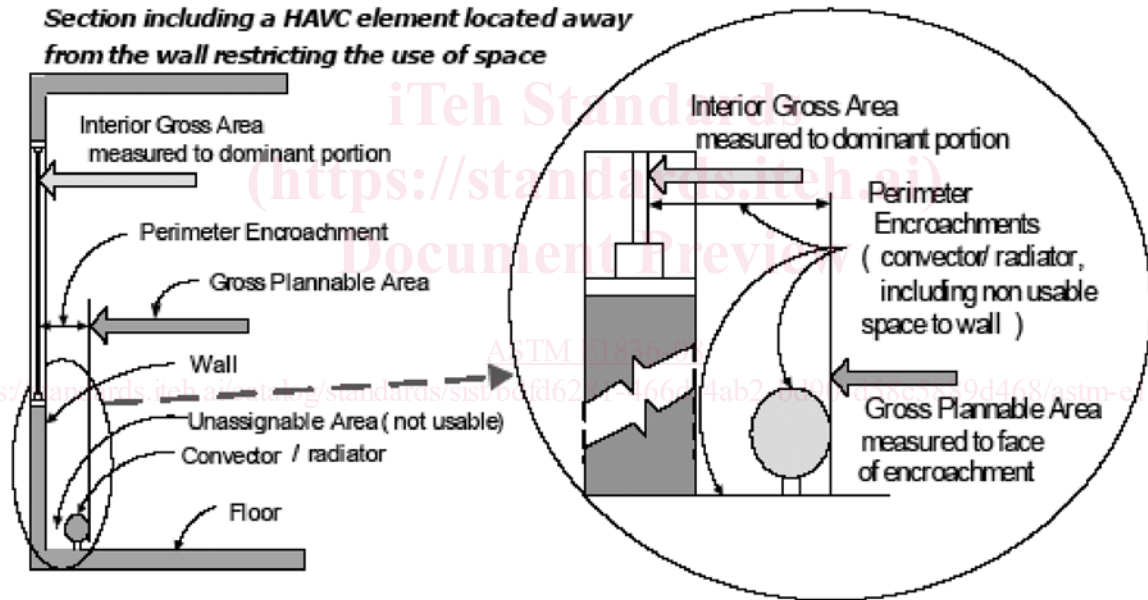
HVAC Element is Located Away from Wall Restricts Use of Floor Area
